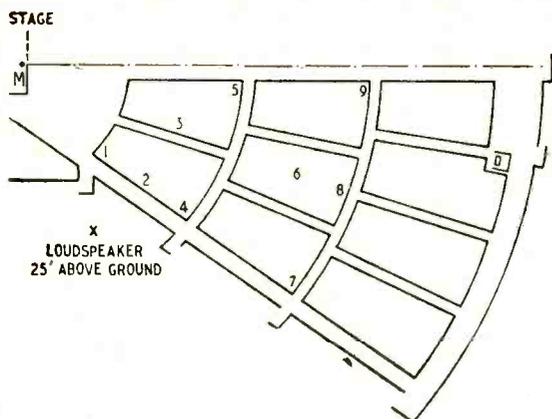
Sketch plan of Finsbury Park Open-air Theatre.
